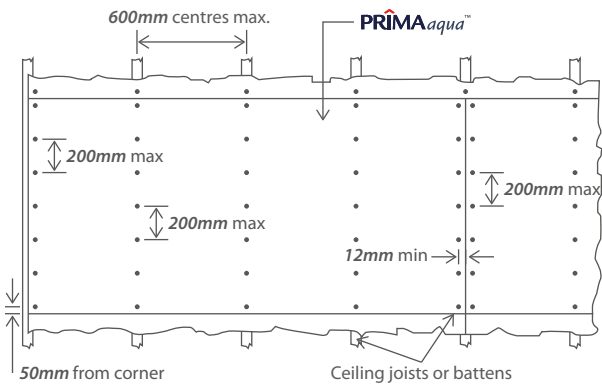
PRIMA<sup>aqua</sup>™ Ceiling - Nail or Screw Fixed
